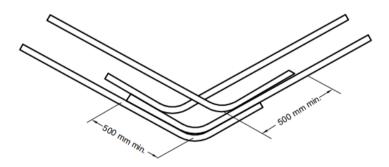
LAYOUT AND DETAILING OF TIE-COLUMNS AND TIE-BEAMS
